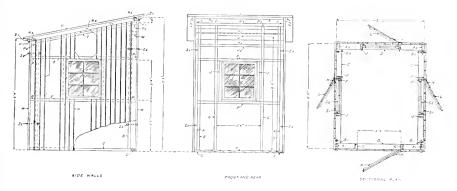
Construction Drawings of the Wooden Shelter Shown in Fig. 2
